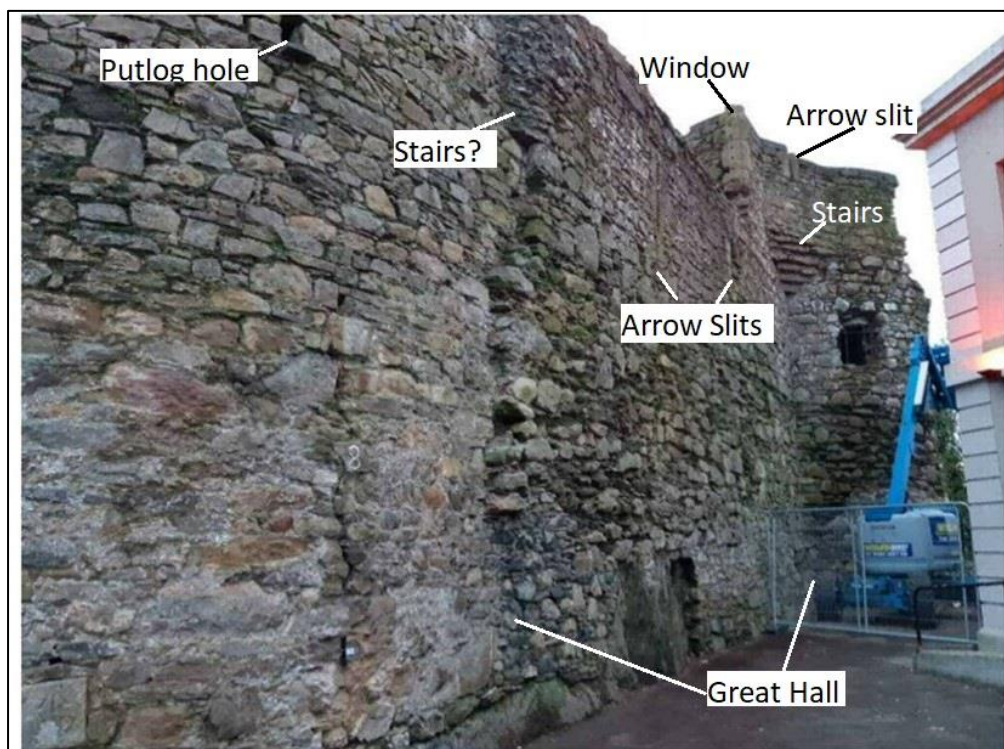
East facing elevation of curtain wall annotated with phases and architectural details (Infrastruct Asset Management Services Ltd, 2019).
